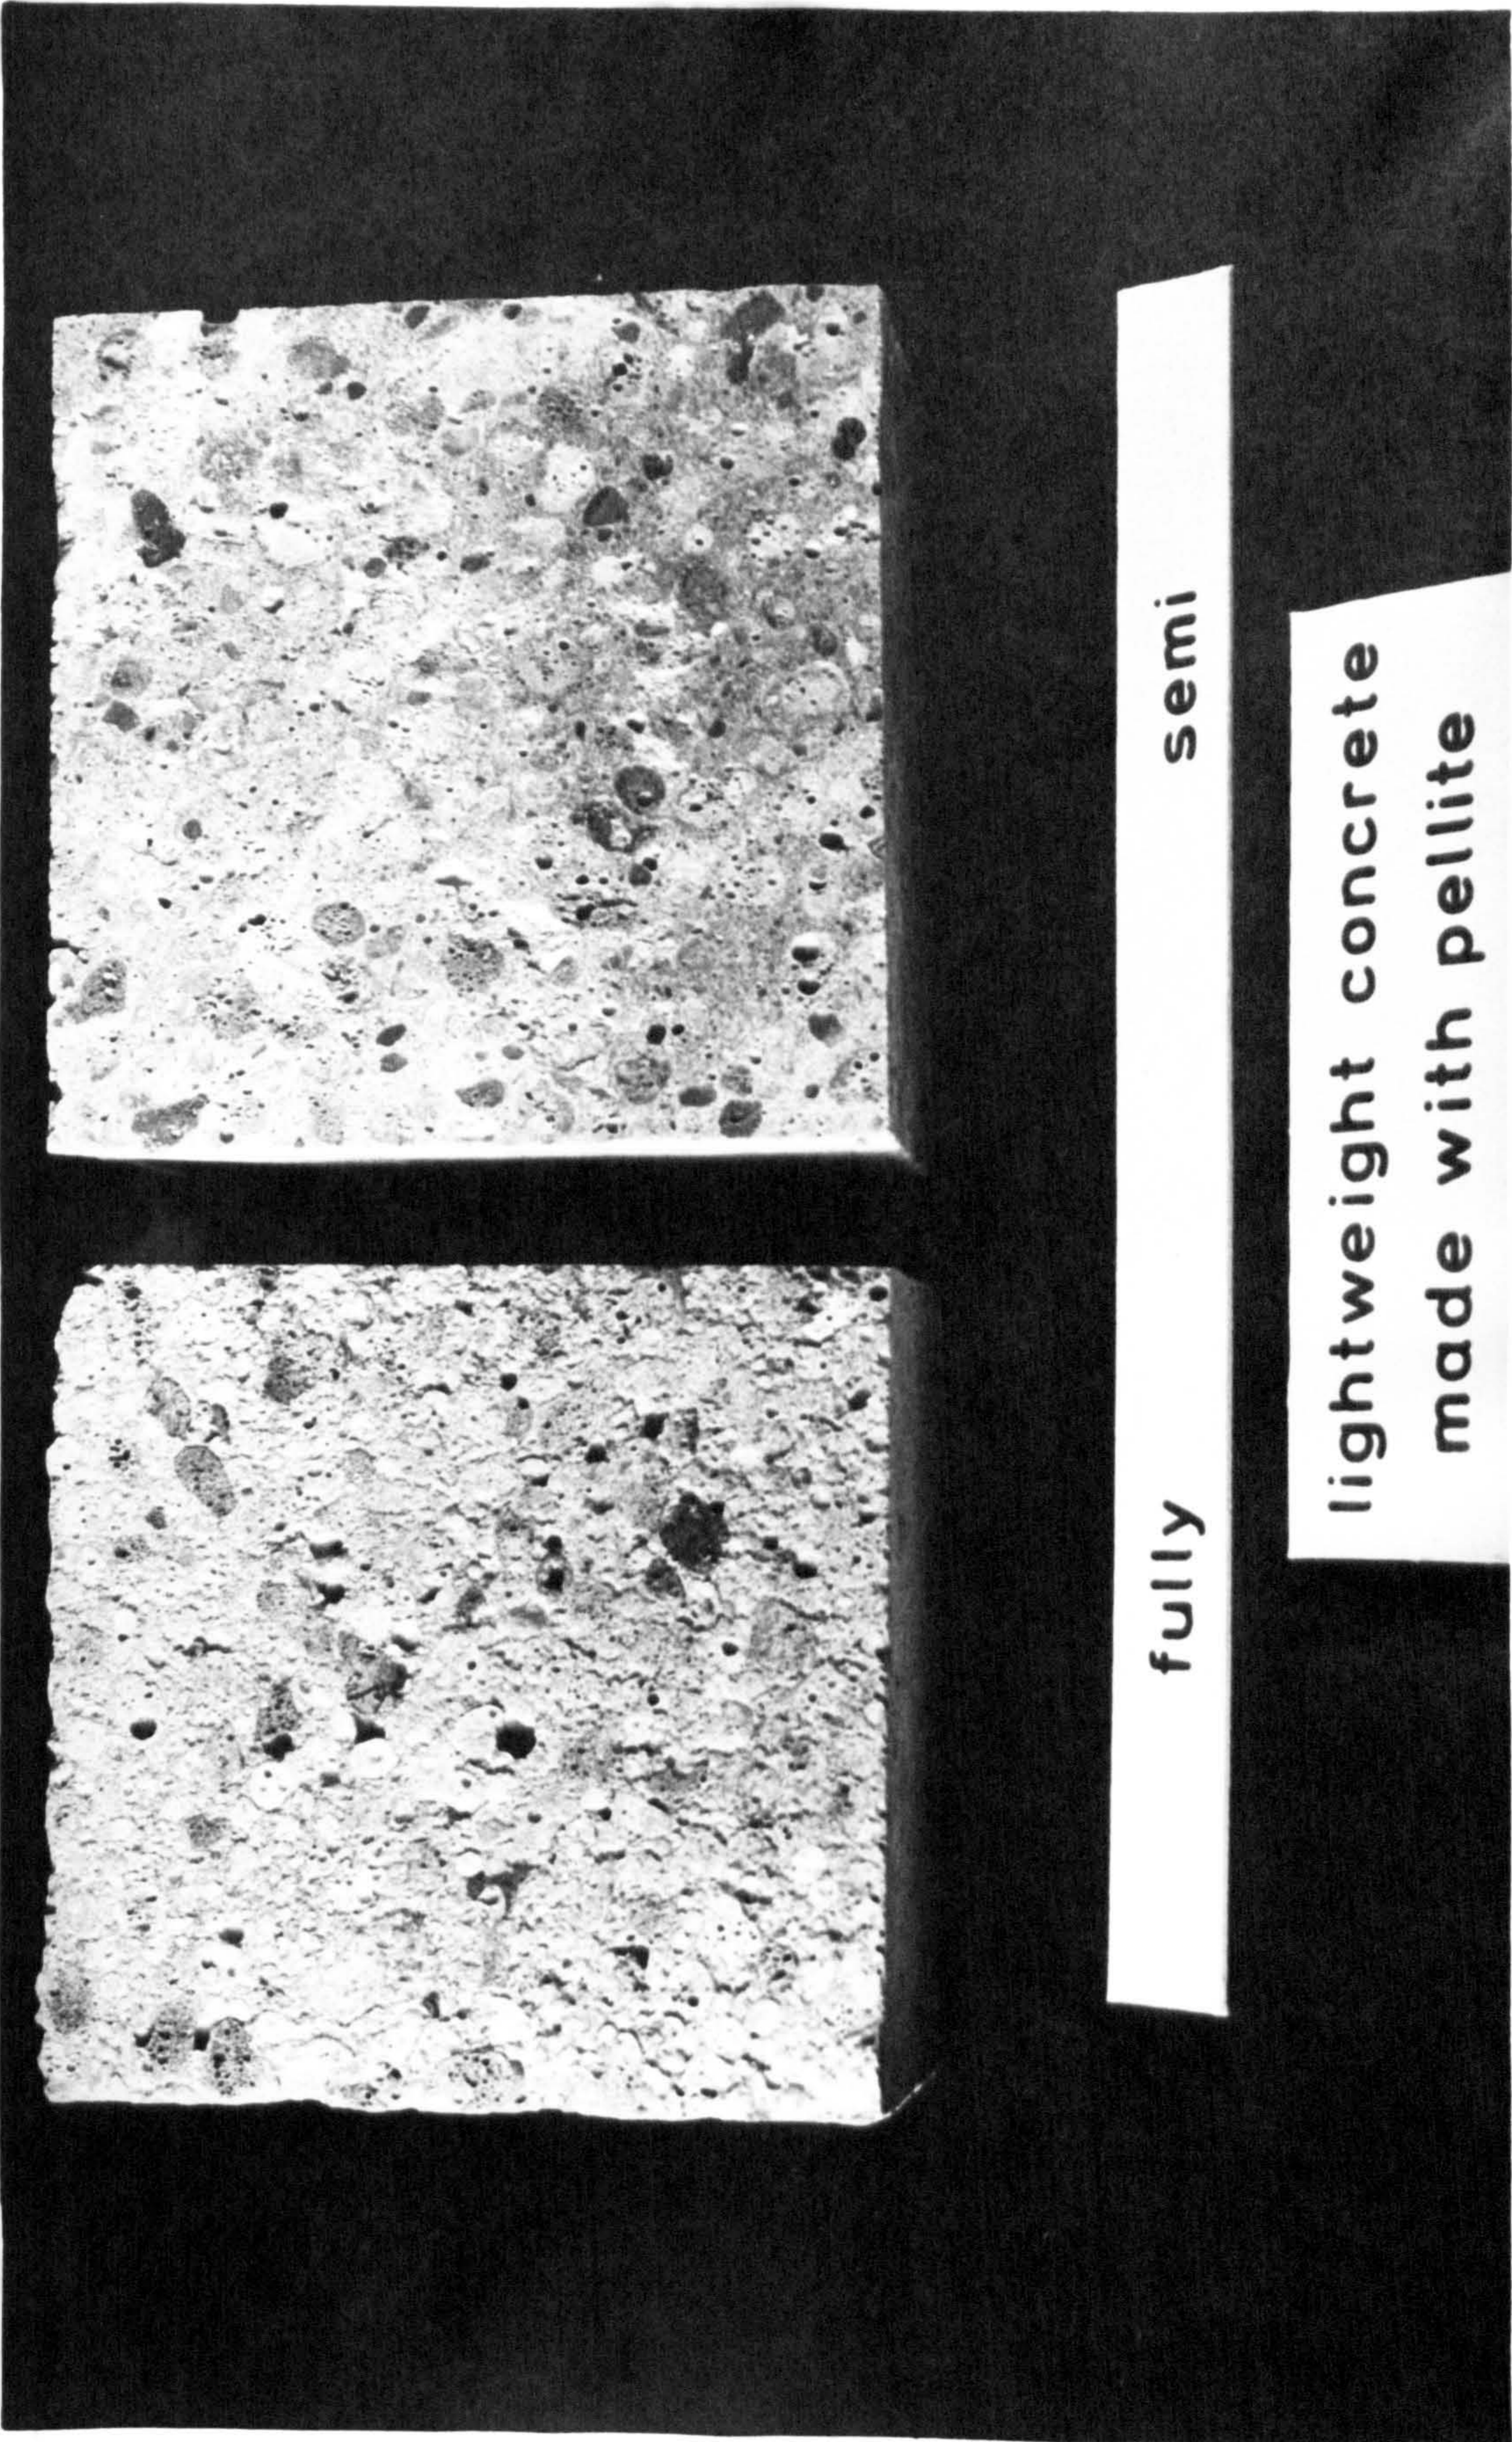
Interior appearance of fully and semi Lightweight Pellite concrete
